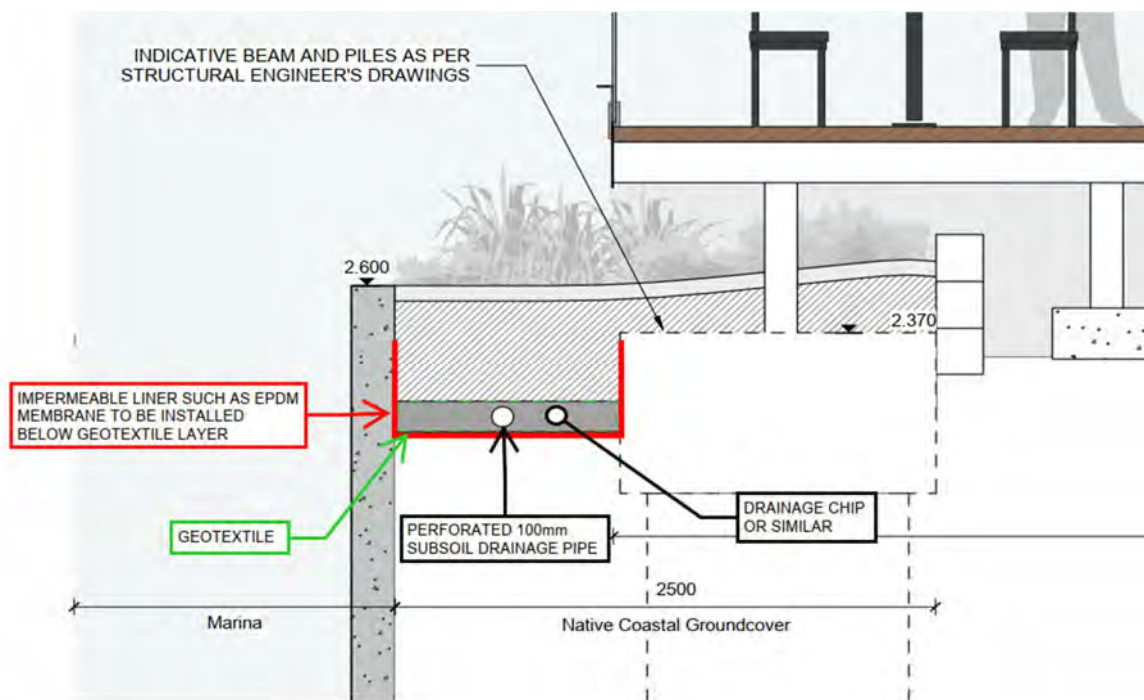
Preliminary design of subsoil drainage with impermeable liner
